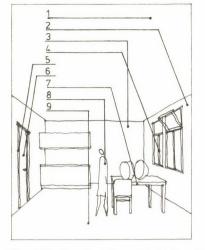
Functionally essential colour-bearing surfaces in a medical examination room: 1) ceiling; 2) wall; 3) wall; 4) window; 5) door casing; 6) door leaf; 7) furniture; 8) coat; 9) floor
